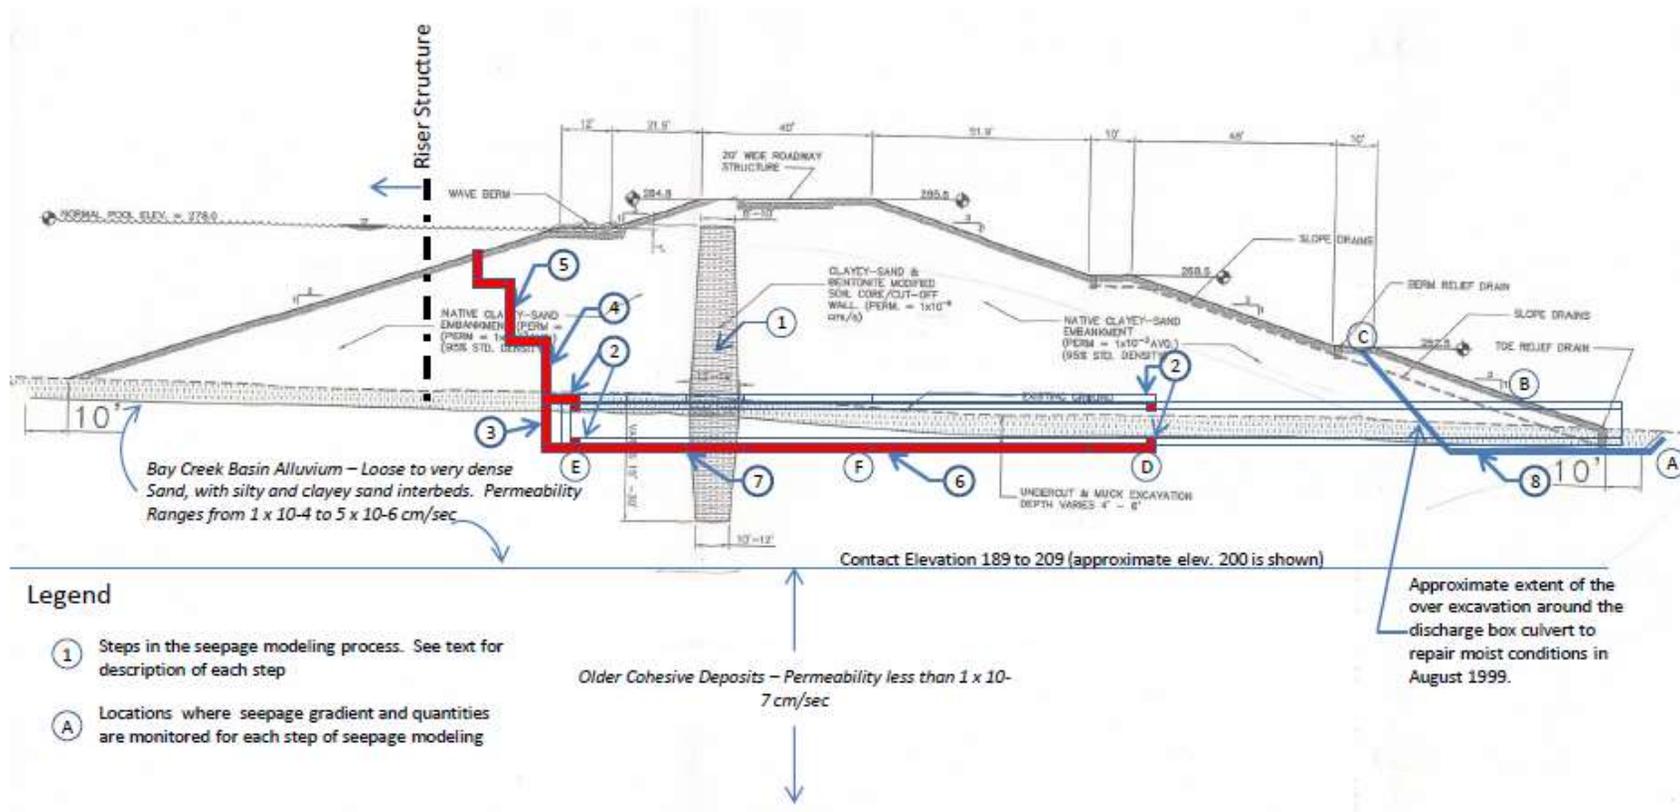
Cross-section of Dam and Outlet Conduit Showing Seepage Modeling Steps 1 through 8 and Model Result Evaluation Locations A through F
